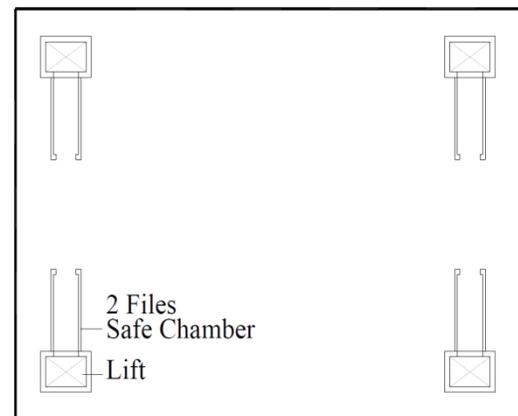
Refuge floor plan designed with designated elevators at building corners.
